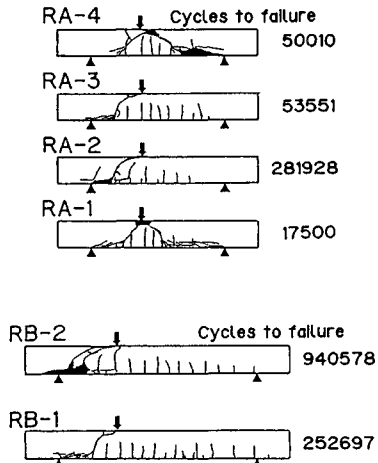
Crack development at failure under a repeated load on a fixed point.
